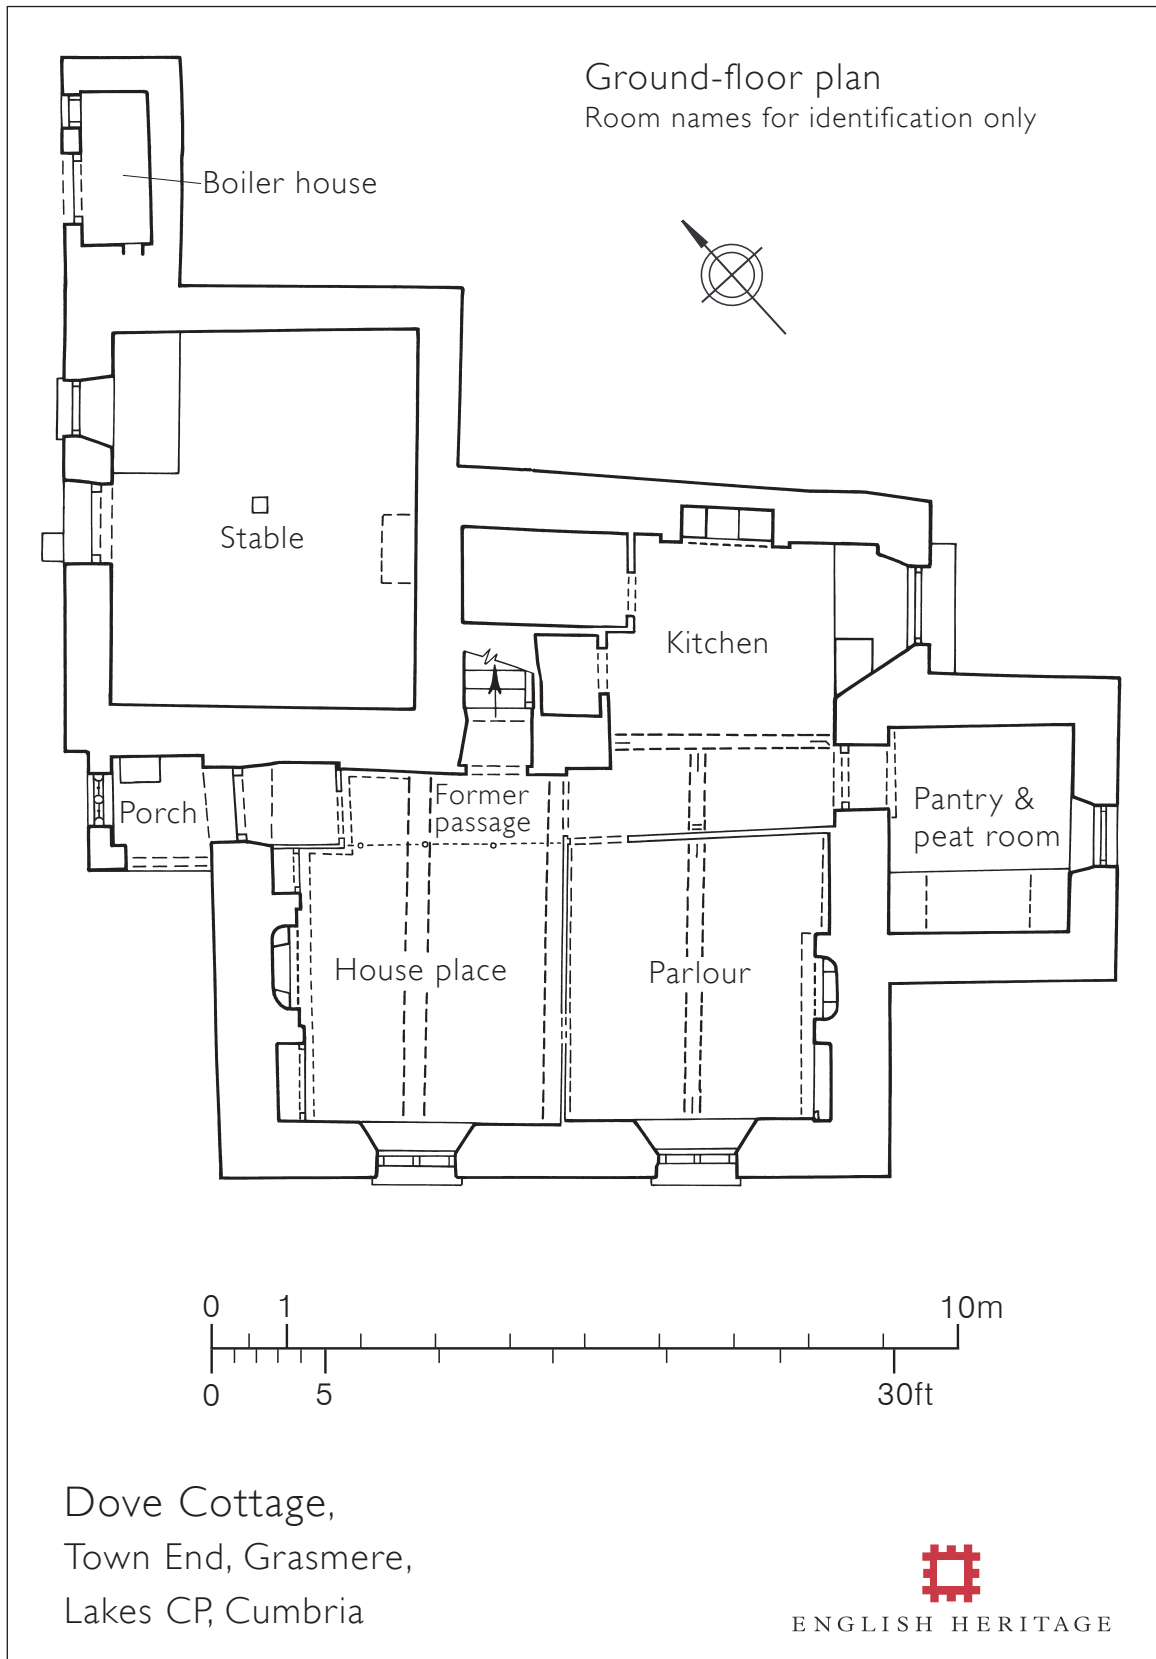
Ground-floor plan of Dove Cottage. © English Heritage
